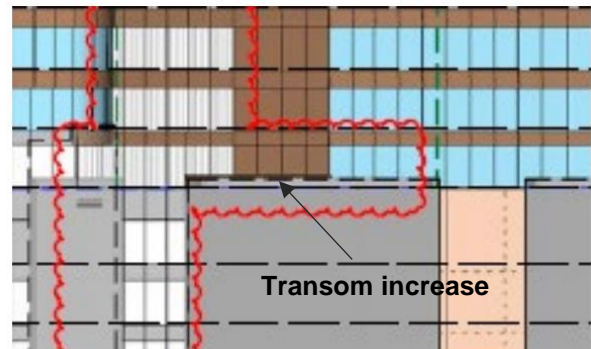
| Proposed additional elevation plan (Source: Modification Report)
